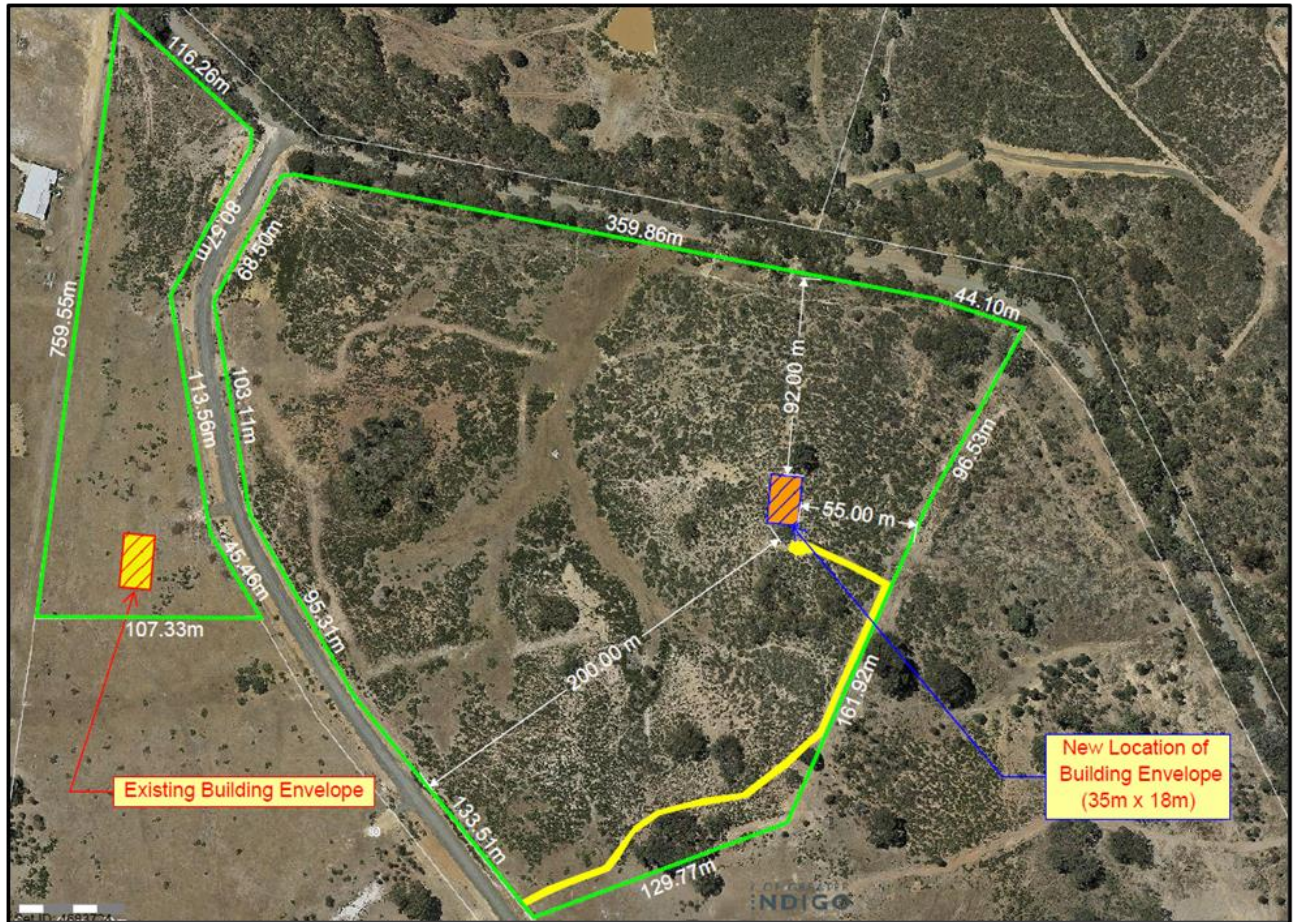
Proposed site plan, note 'existing building envelope' is indicative only (not a title restriction).
